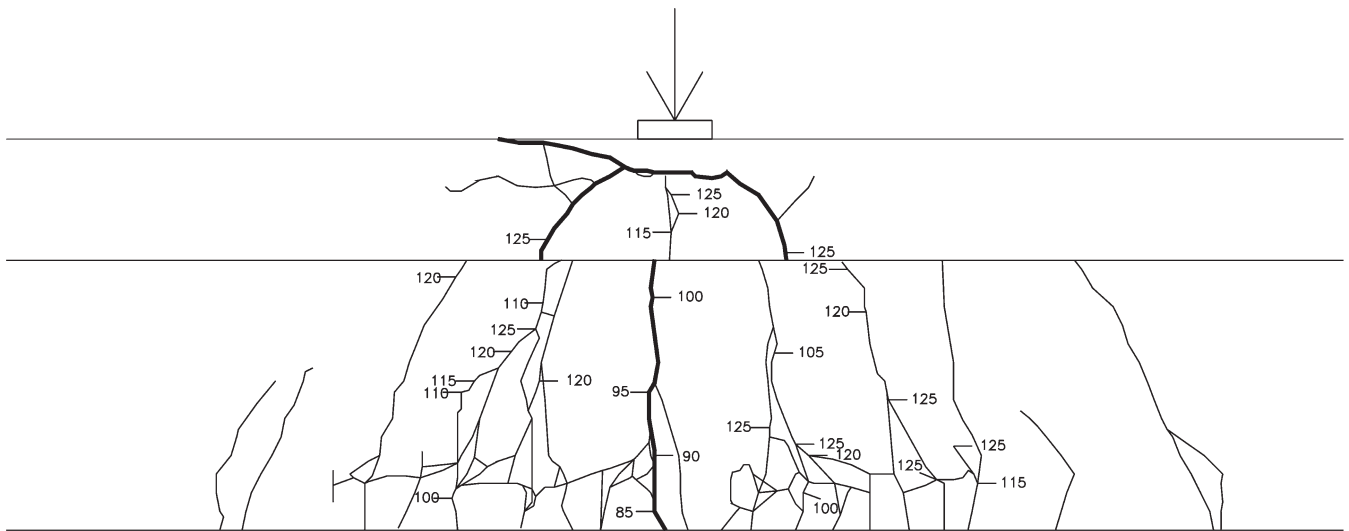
Crack patterns at failure of multiple-strand development length specimen HPC-1 (south face).
